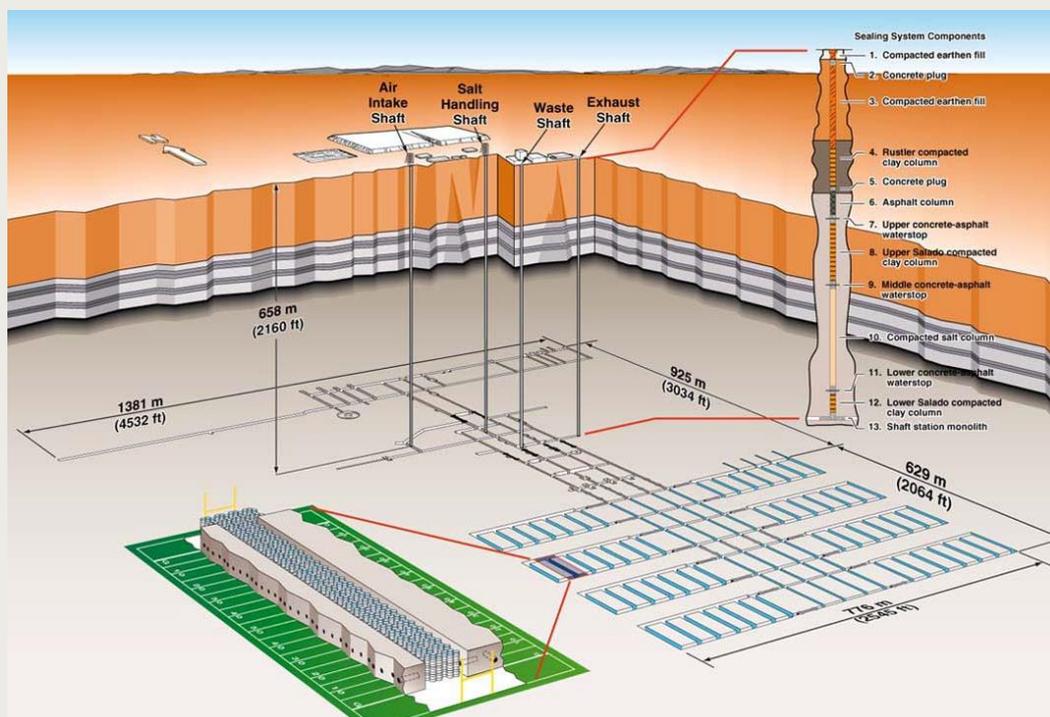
Layout of the Waste Isolation Pilot Plant.
